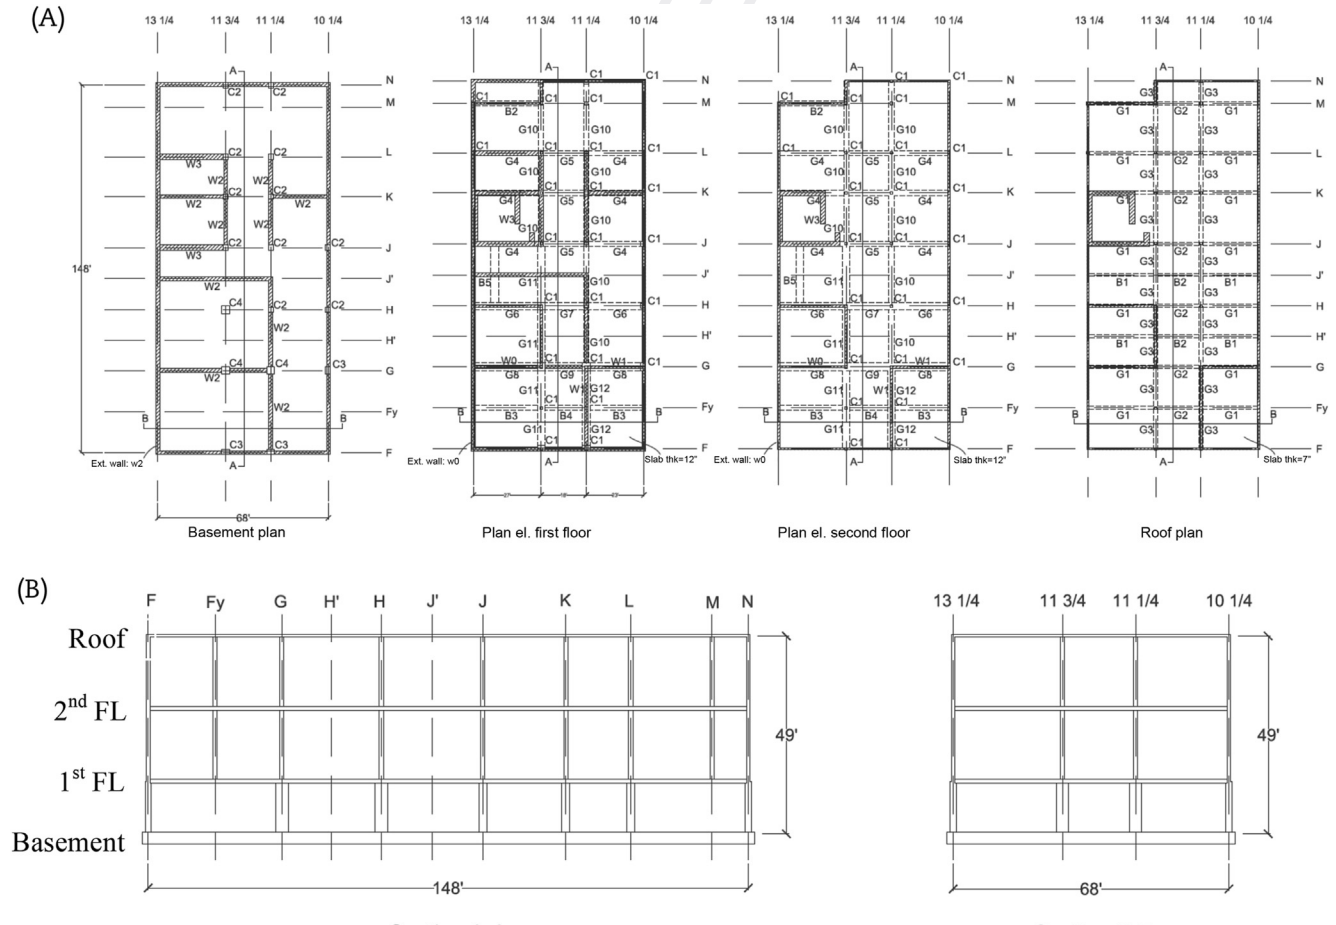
Modified structural plans of Connecticut Yankee nuclear power plant auxiliary building. (A) Plan drawing of each level. (B) Elevation drawing of each side. FL, floor.
